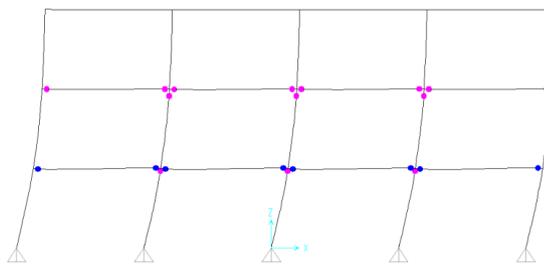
c Plastic hinges in RC building propagates to the intermediate column
